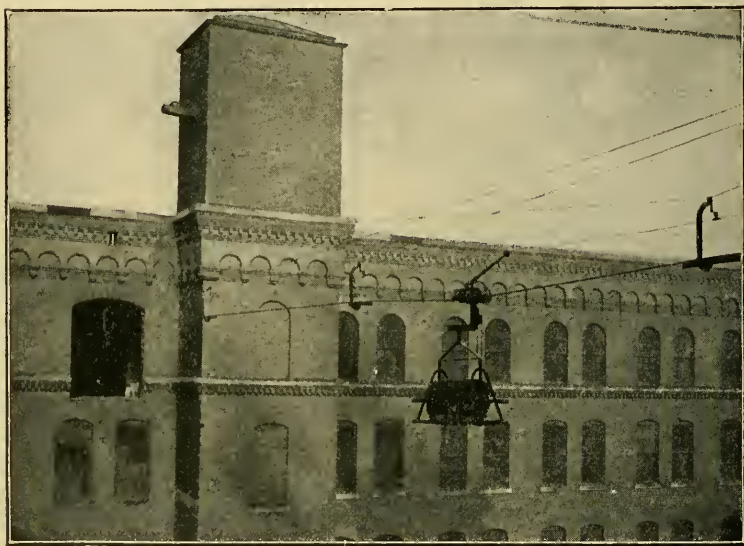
Cable construction, Pittsburgh, Pa., line 97 feet from the ground, illustrating suspension cable, track cable and hangers.
